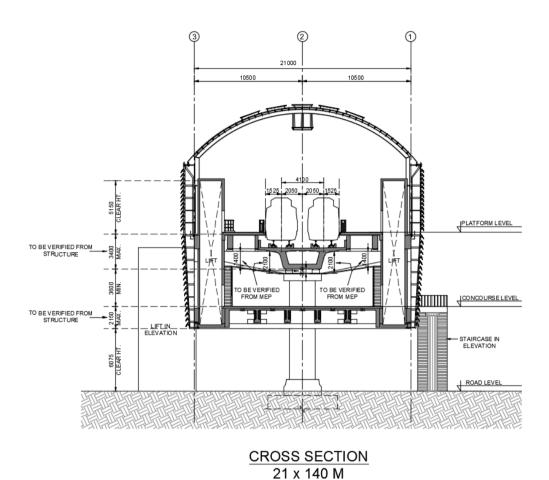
Cross section of elevated typical elevated station (Source: Systra 2018)
